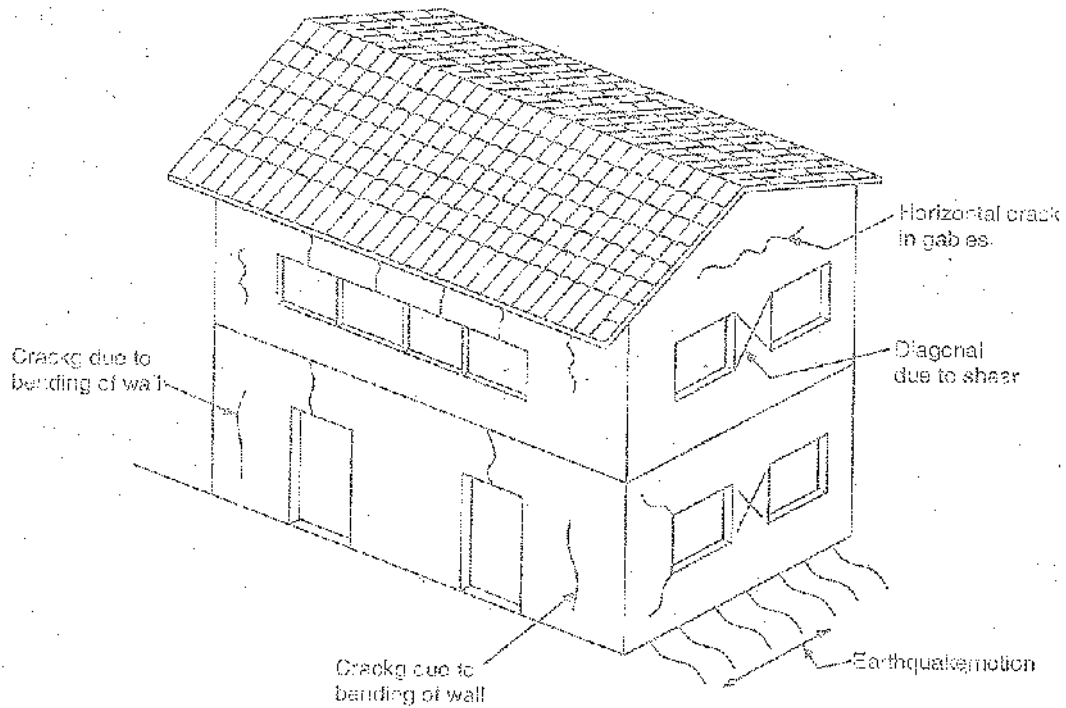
(a) Cracking in bearing walls due to bending and shear
